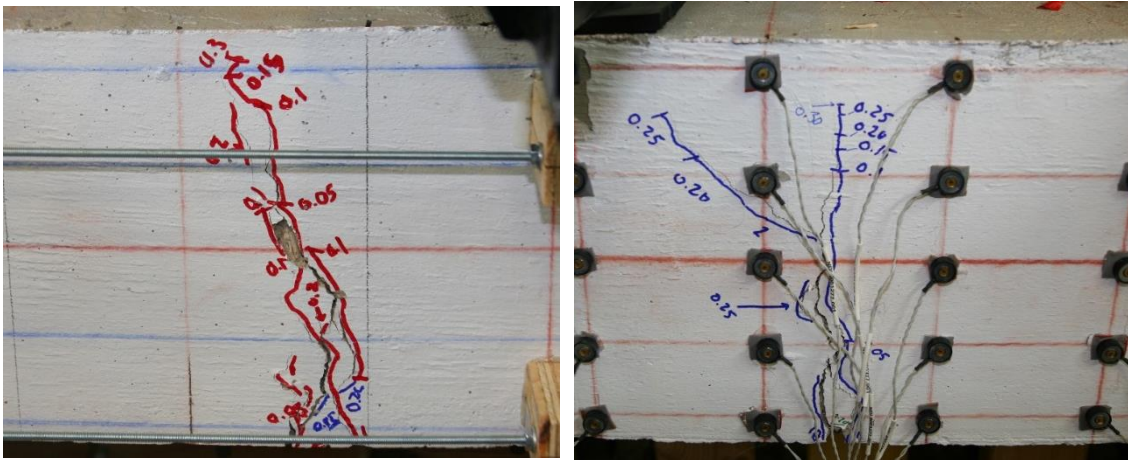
"Accessory" and Branching Cracks of Specimens without Steel Reinforcement S7505NOS00
